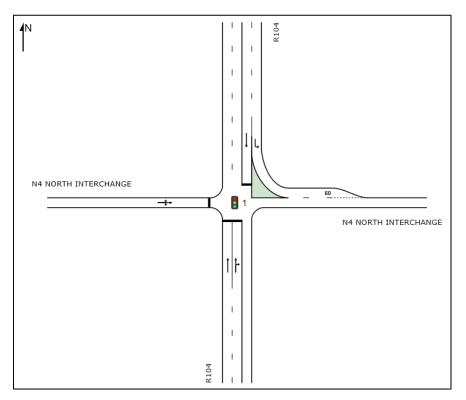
Intersection 1 Proposed Layout (Background Traffic)
